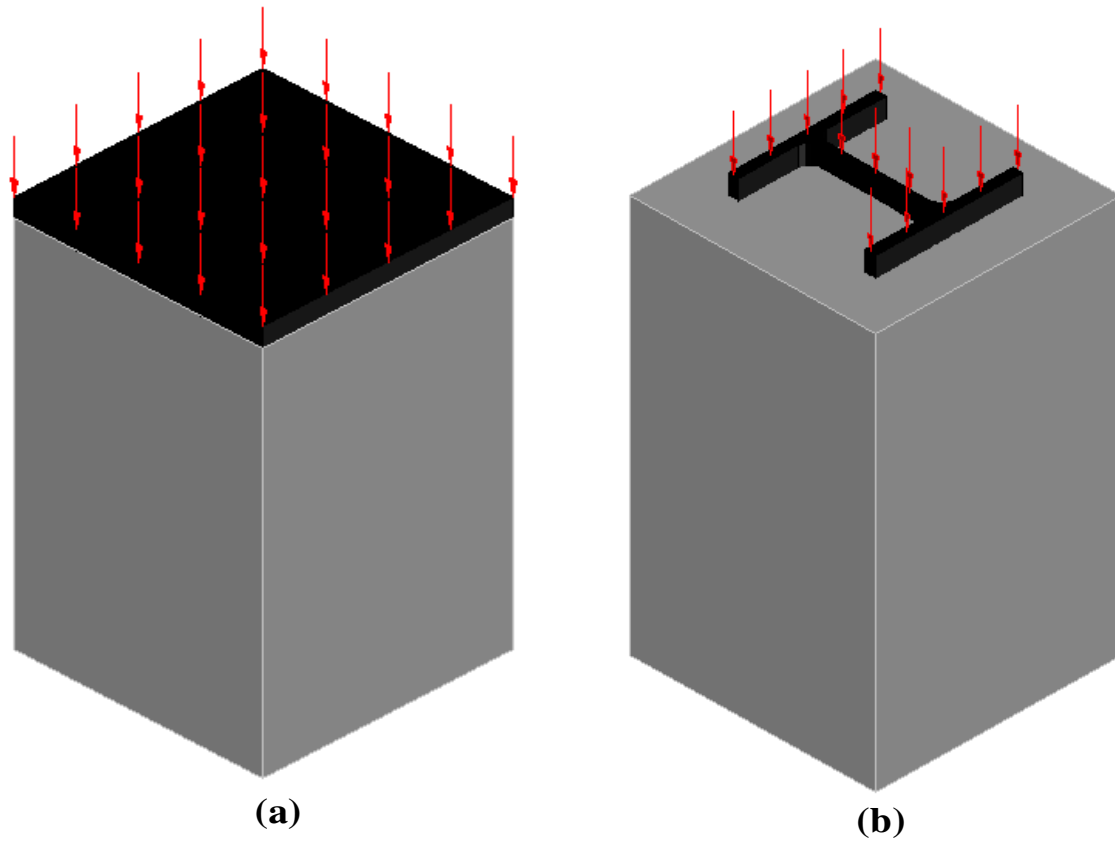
Two ways of applying load to the column: (a) Loading through the whole section W, by using column head; (b) Loading through the steel core C, protruded from column section.
